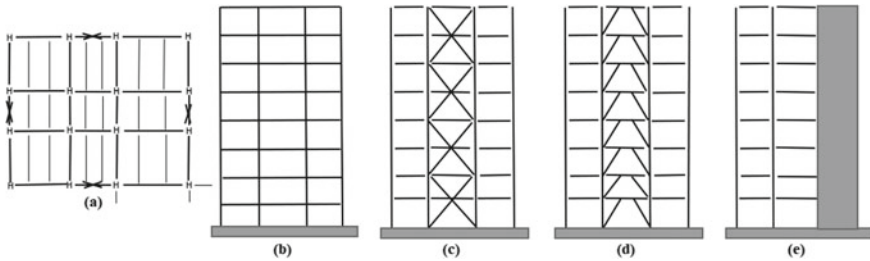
Earthquake-resistant systems in steel str.: a floor plan, b moment resisting frame, c concentrically braced frame, d eccentrically braced frame, e steel shear wall
